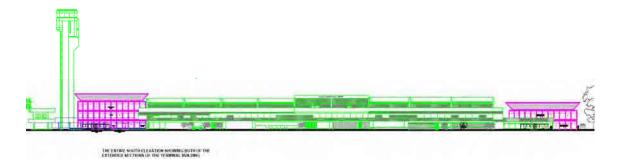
Passenger Building Expansion Plan by ADL (elevation seen from the airside)
